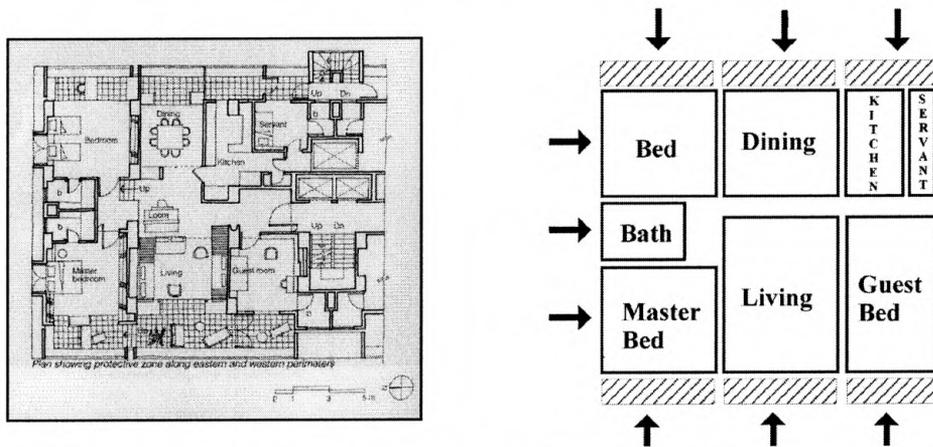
Plan and Room layout sketch of individual unit.
